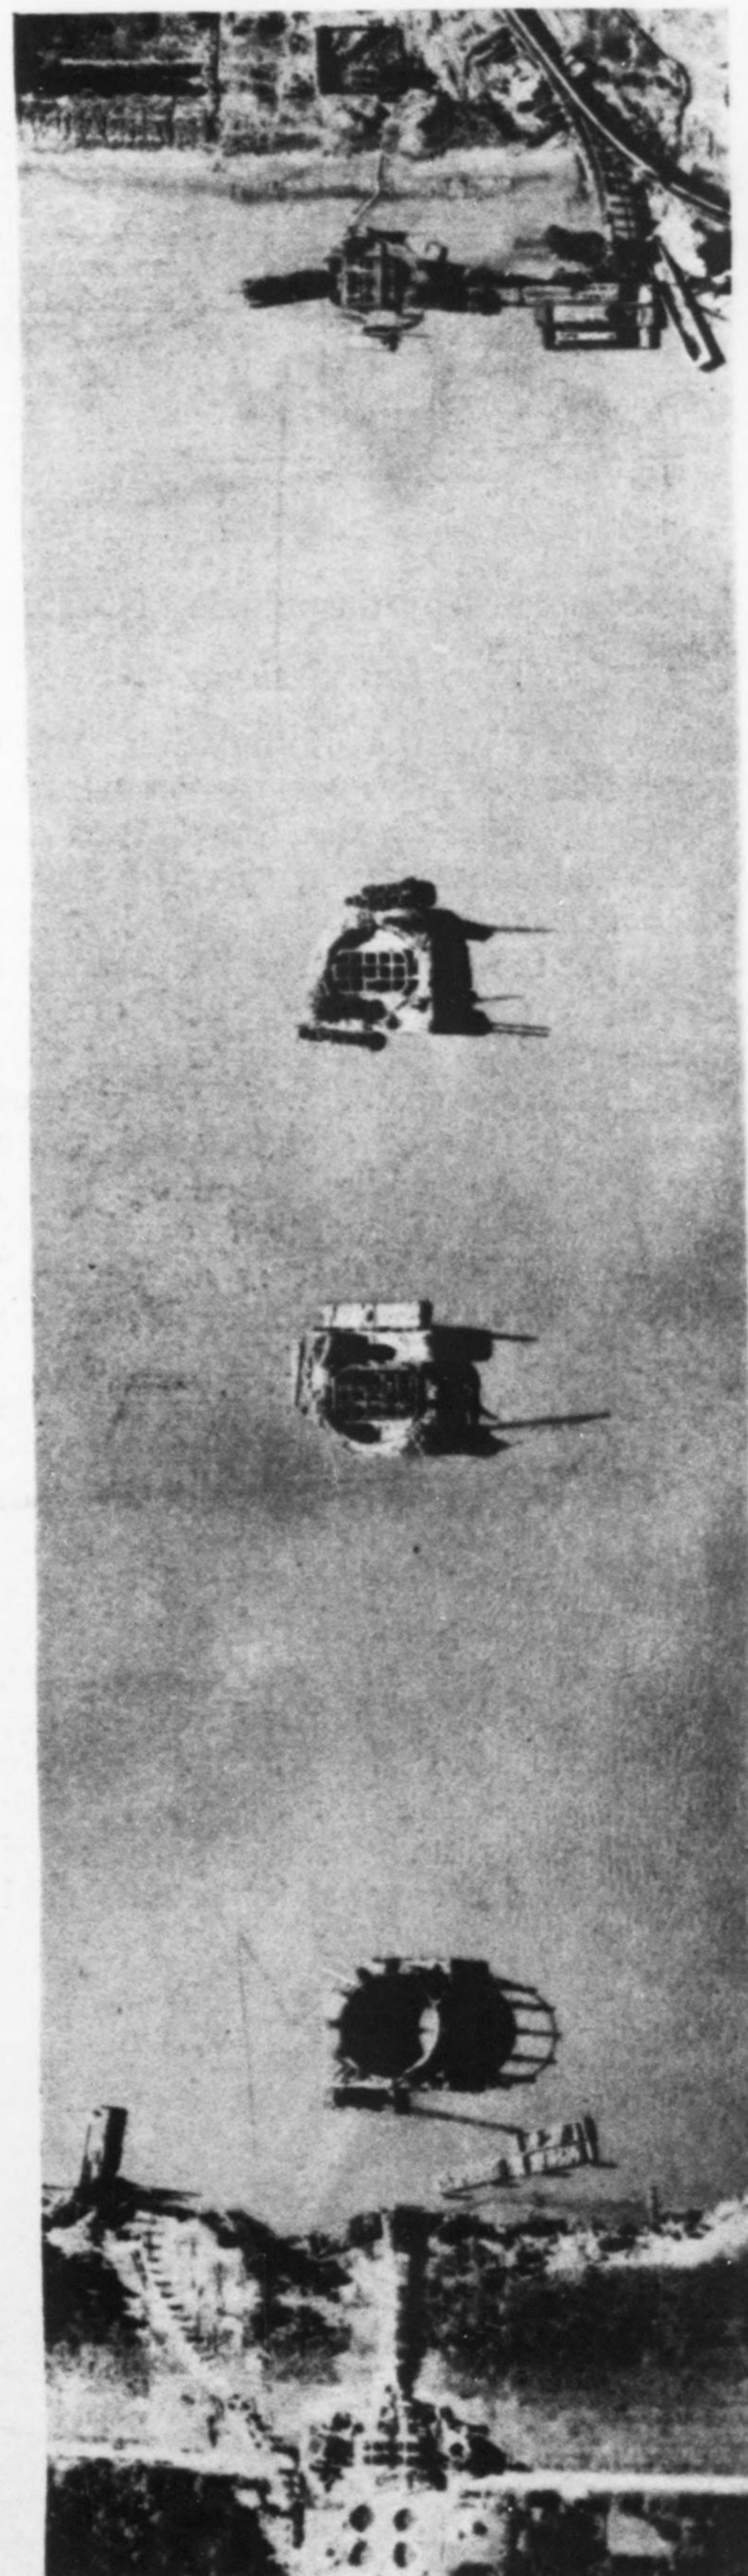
ARTIFICIAL SAND ISLANDS are used to facilitate construction of the piers of the New Orleans Bridge. The islands for four piers, Nos. 1, 2, 3 and 5, reading from the bottom, are shown in this airplane picture. Construction of the island for Pier 4 has been begun since this picture was taken. At the lower edge of the picture is excavation for a viaduct tower footing, and above it, adjoining the road, is Pier A.
